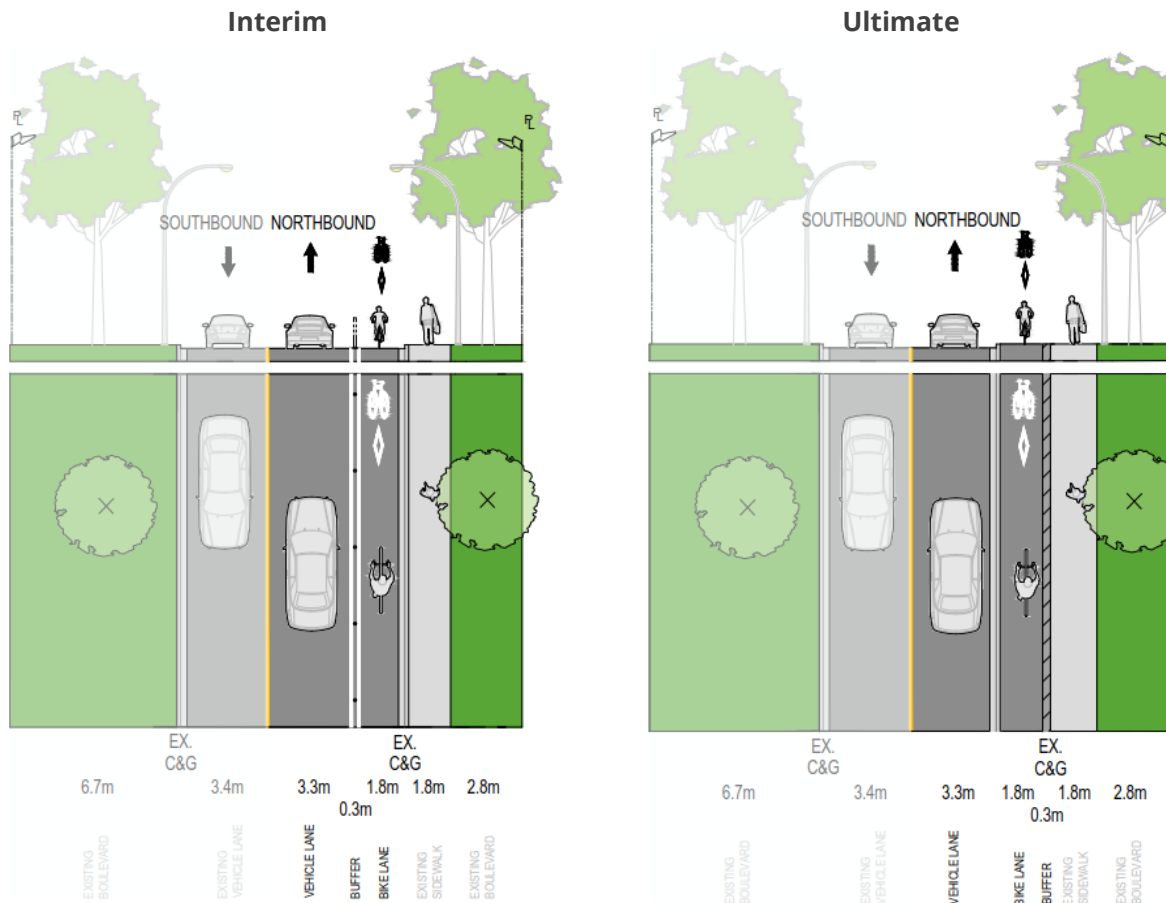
Bergstrom Road Proposed Illustrative Cross-Section
